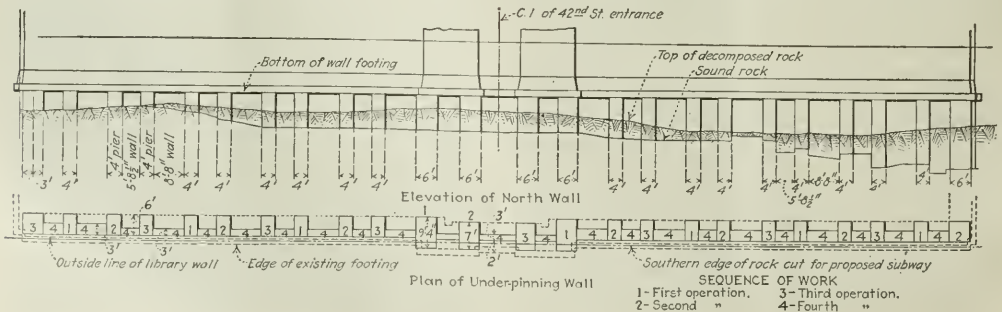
PLAN AND ELEVATION OF THE NORTH WALL
